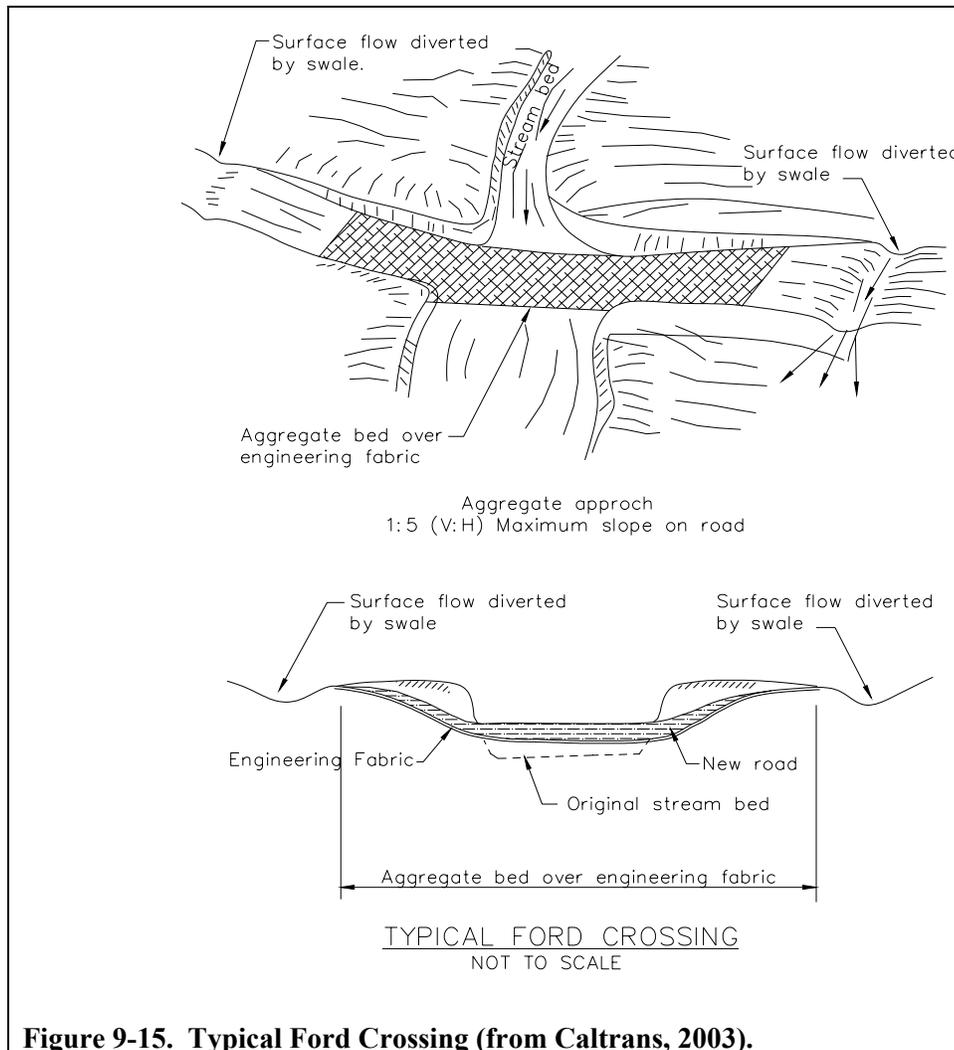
Typical Ford Crossing (from Caltrans, 2003).
